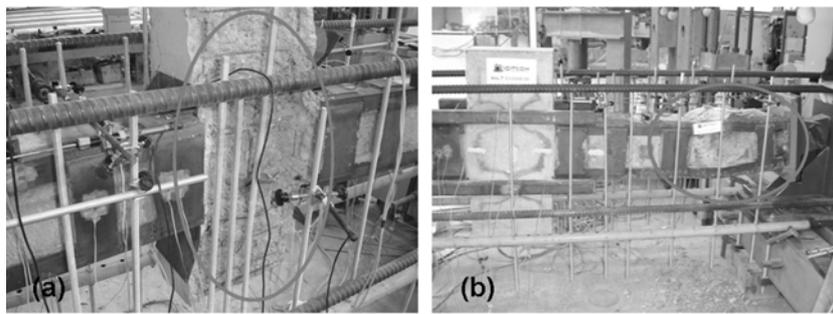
Failure modes. (a) Specimen AxL.C; (b) Specimen AxL.T
